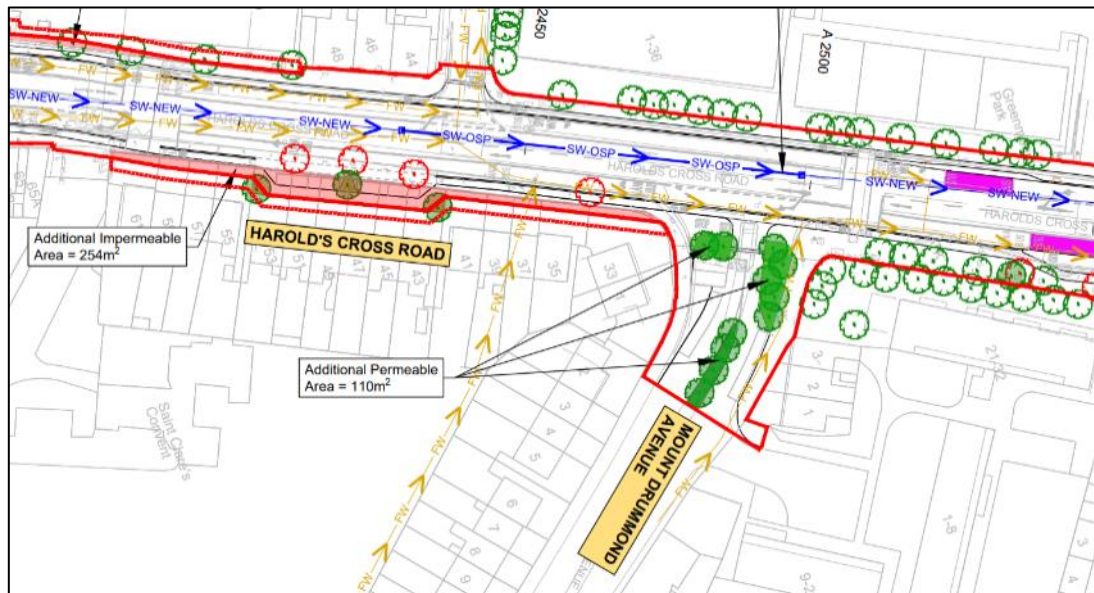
Proposed Scheme Drainage on Harold's Cross Road at Junction with Mount Drummond Avenue
